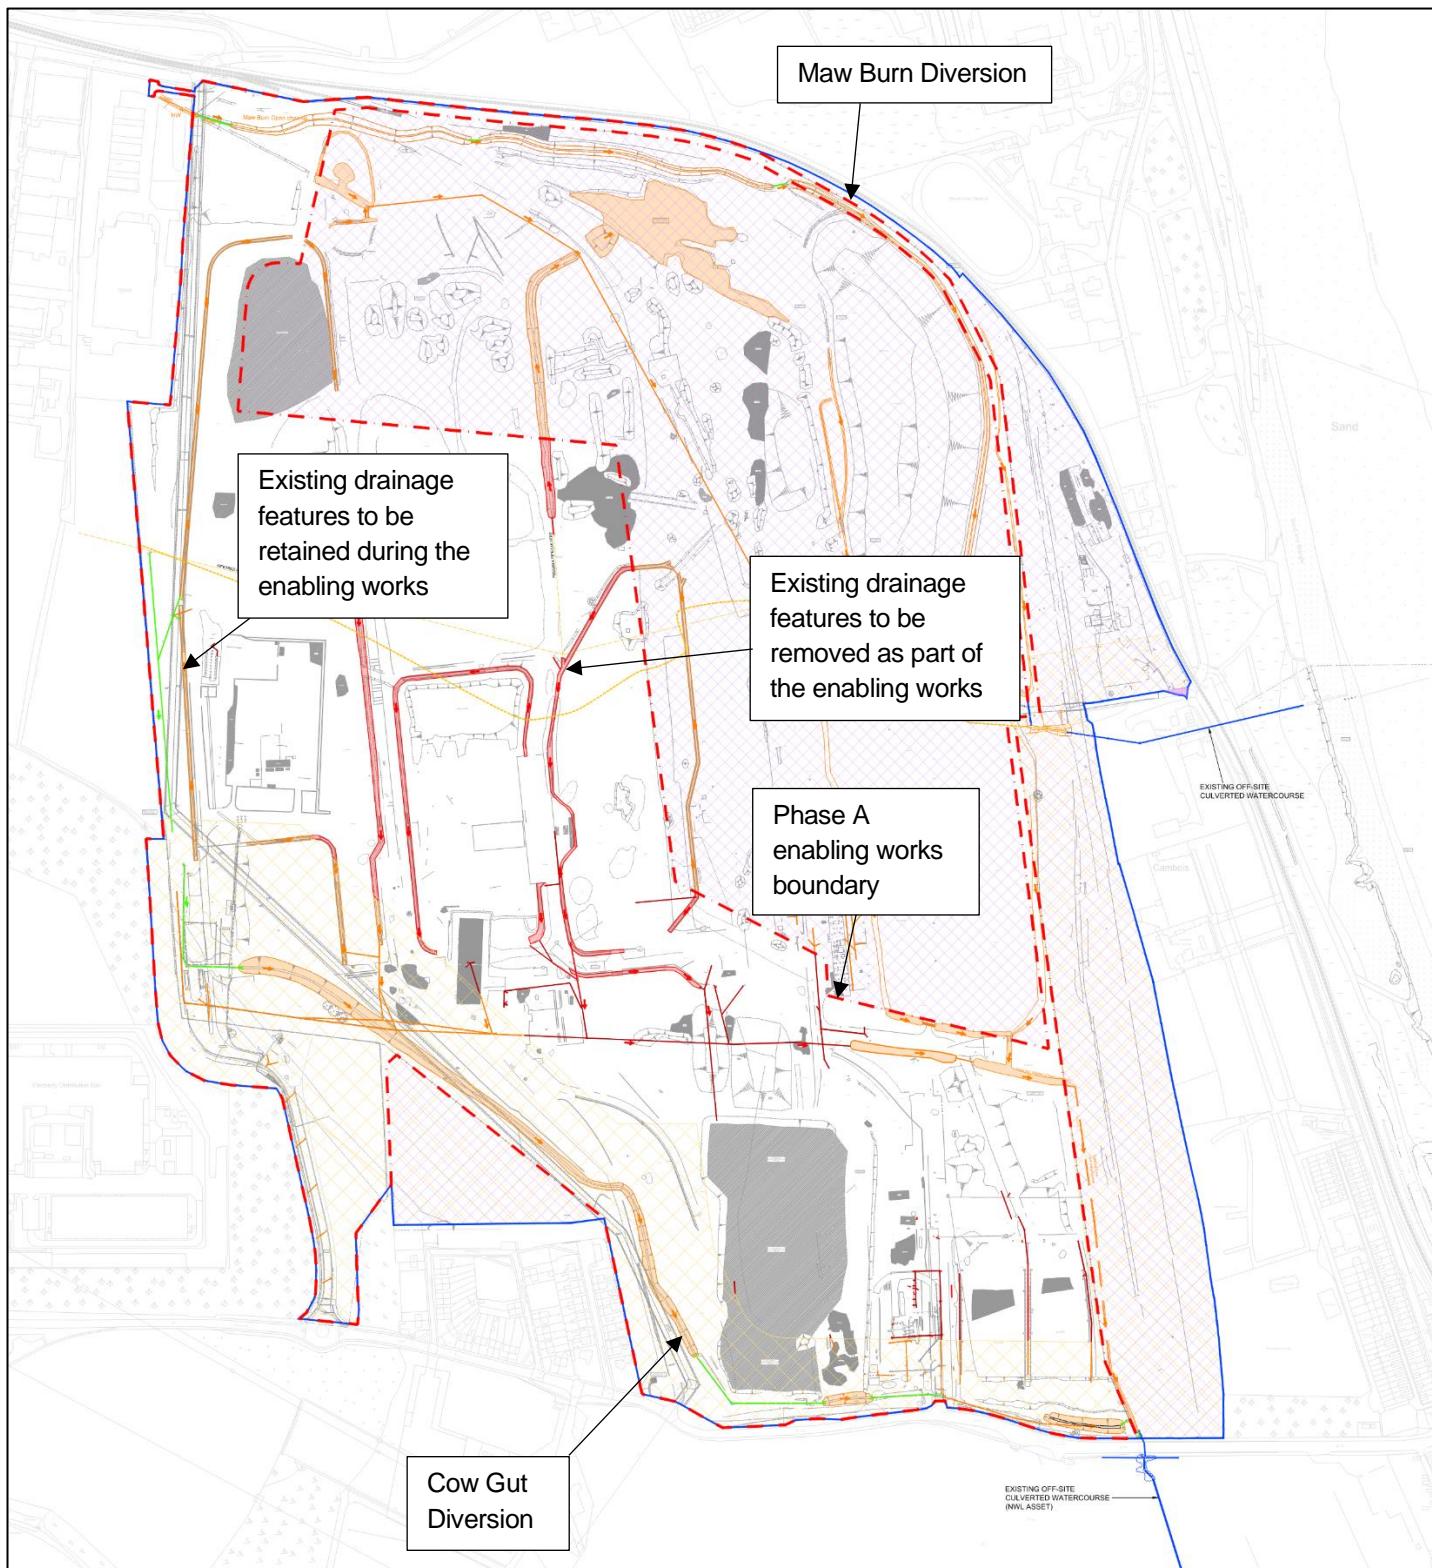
Enabling Works Phase A - Existing Drainage Plan
